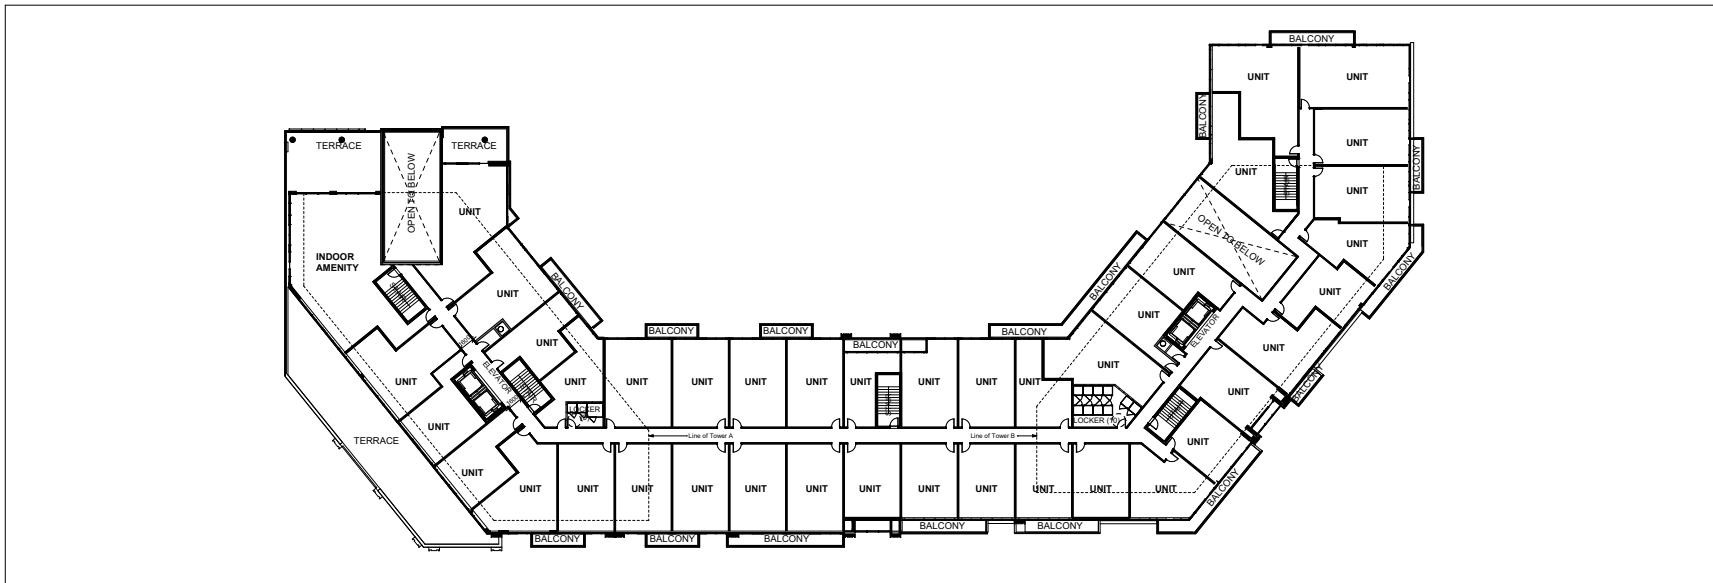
LEVEL 1 PLAN (KIRKOR ARCHITECTS)
